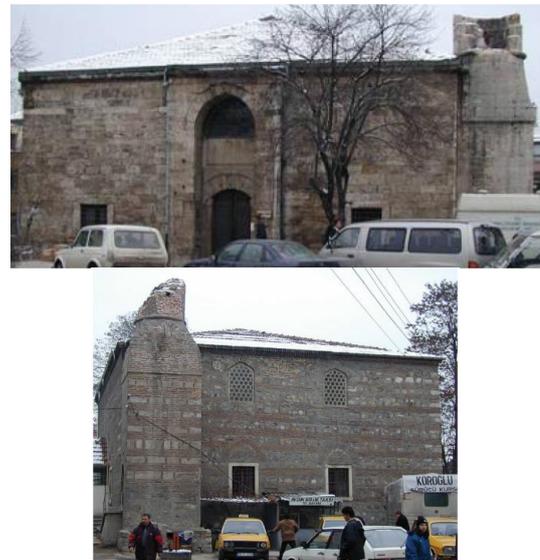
Damage patterns of masonry minarets (Doğangun and Sezen 2012)
